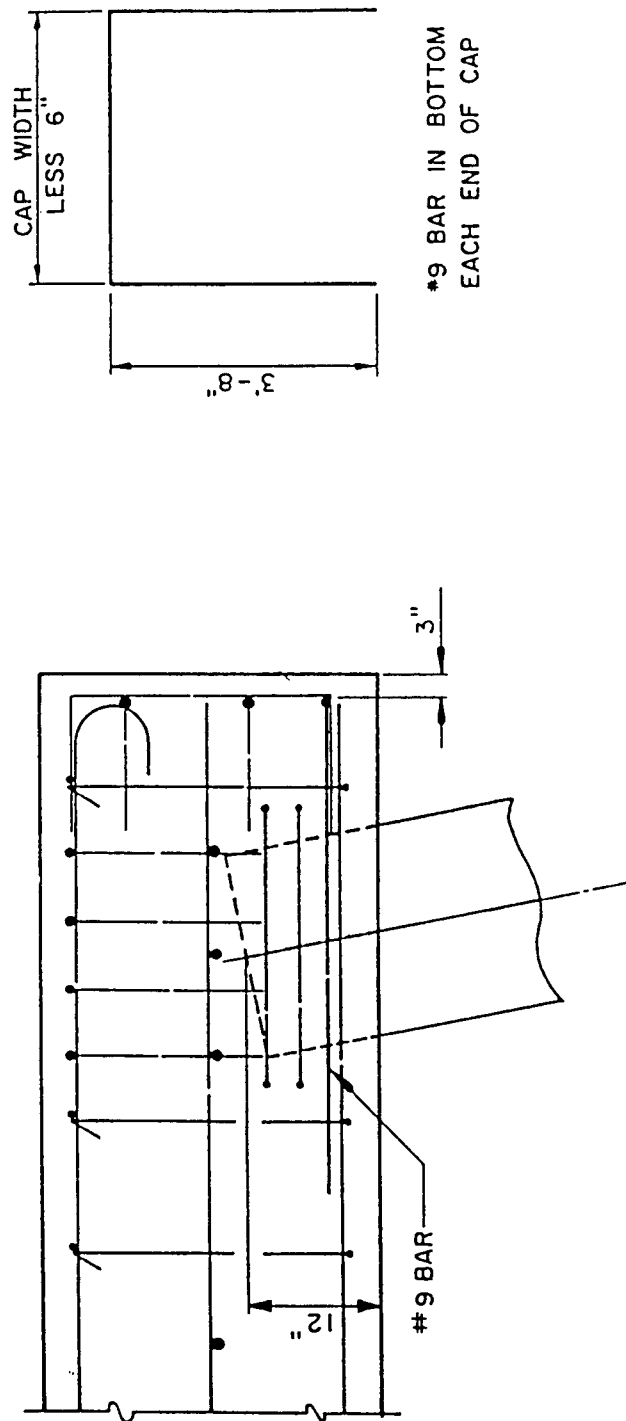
North Carolina Typical Double Row Pile Bent Details
